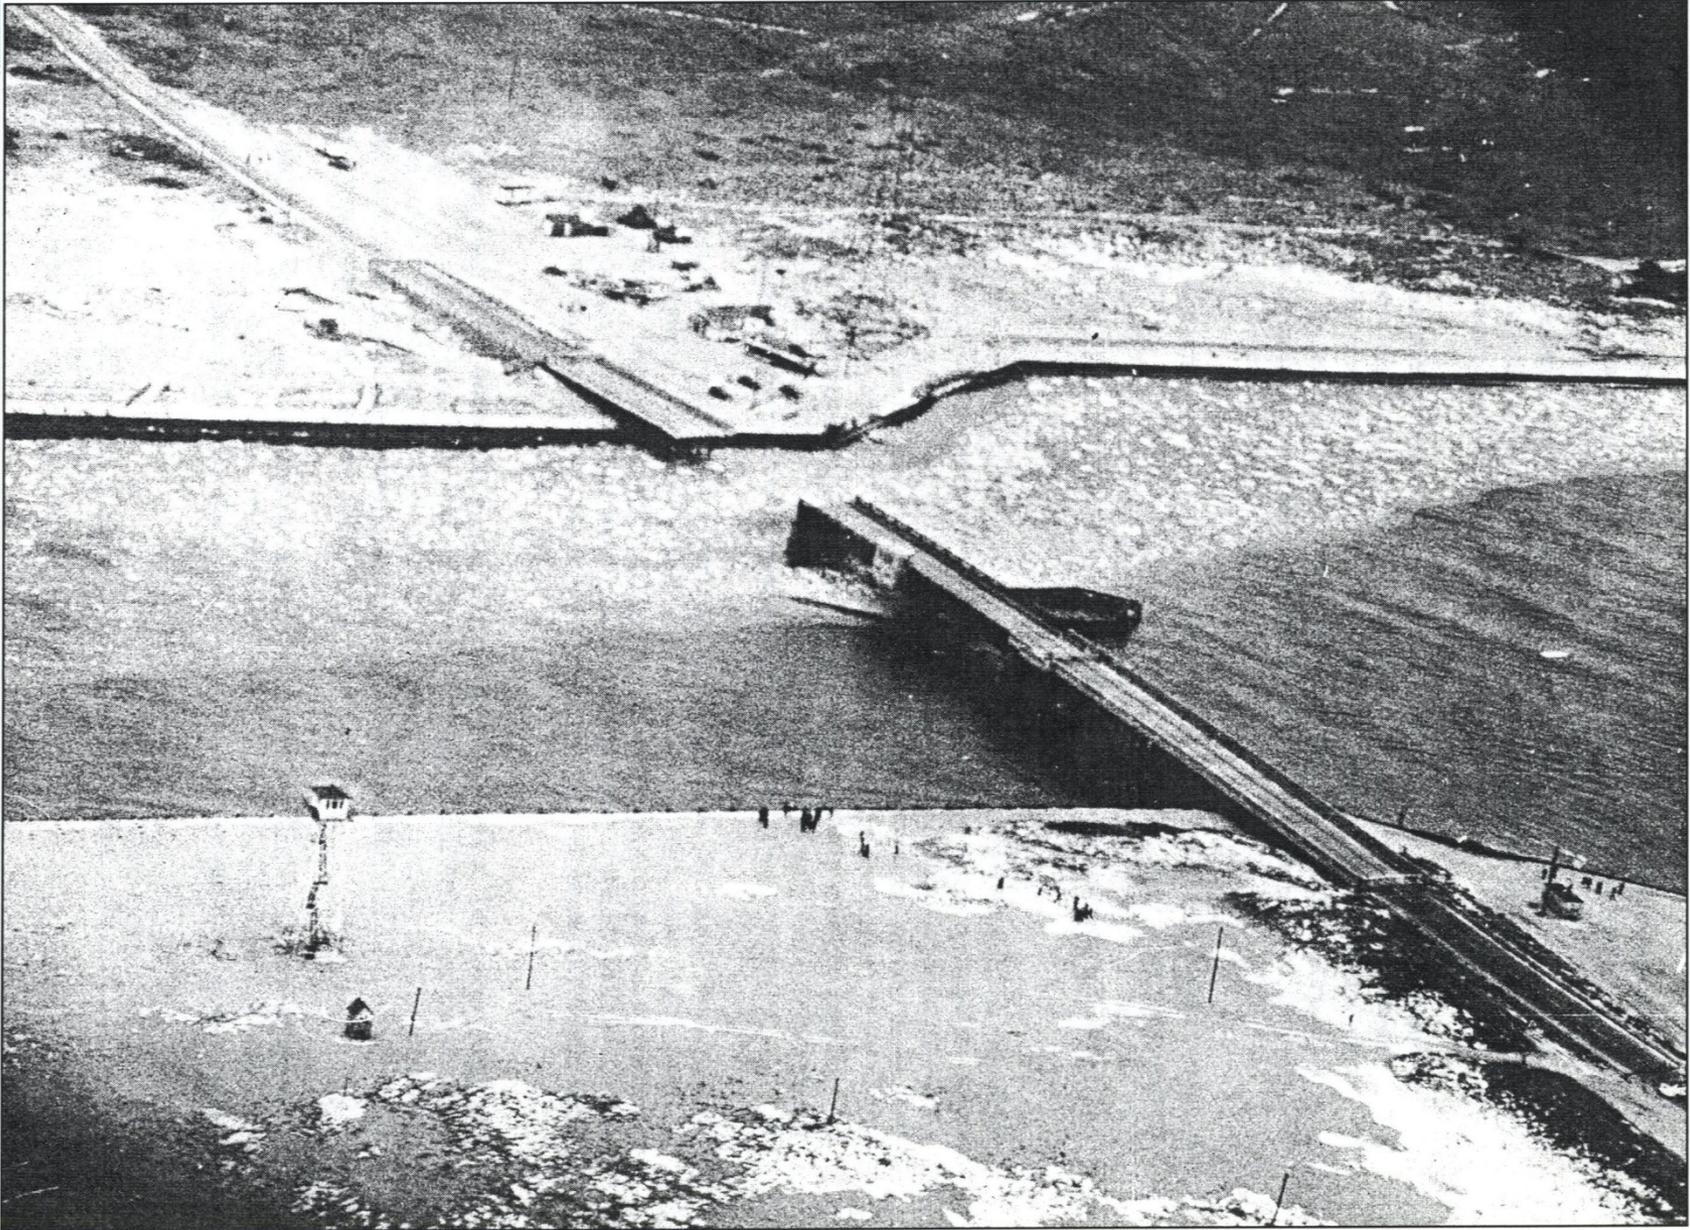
Aerial view of Cullen Bridge after destruction of south bridge trestle toward southwest. RG 1325. General Photo Collection: Transportation.
